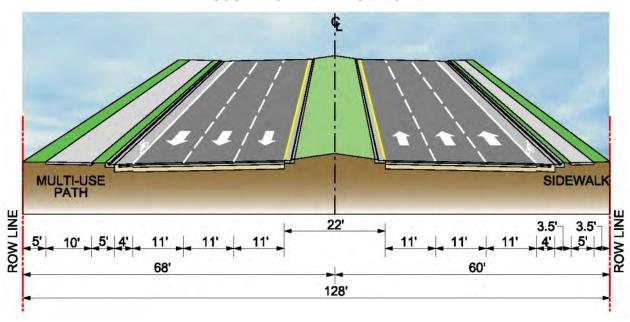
SIX-LANE DIVIDED URBAN TYPICAL SECTION PROMENADE TOWN CENTER TO FORT KING ROAD
